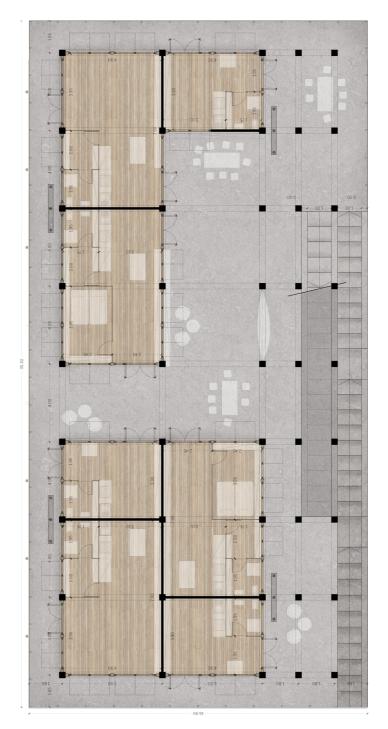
Configuration G: layout of the standard floor-plan during the day.
